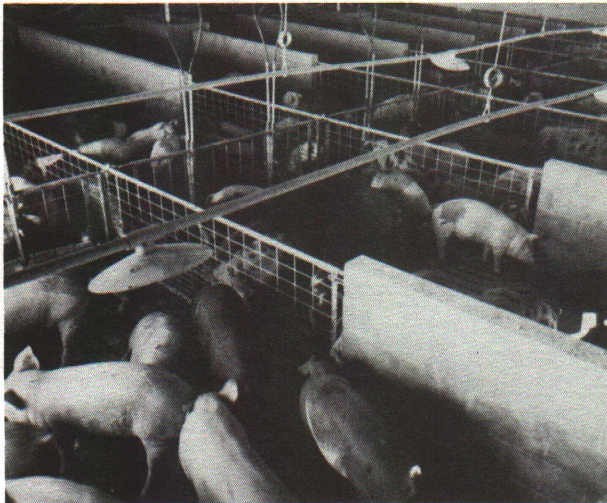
Concrete block partitions on the solid portion of the floor with open gates over the slats.
